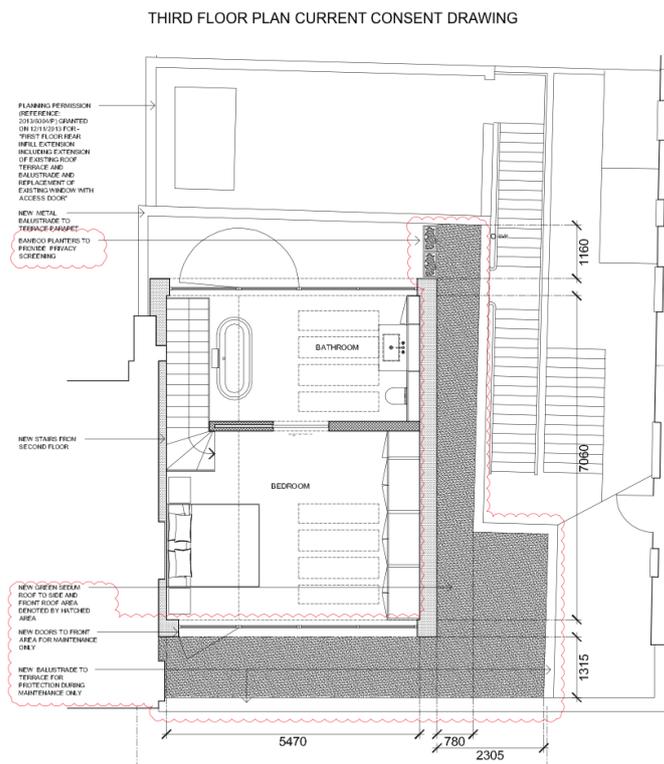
Plan approved on Appeal showing extent of Sedum Roof
